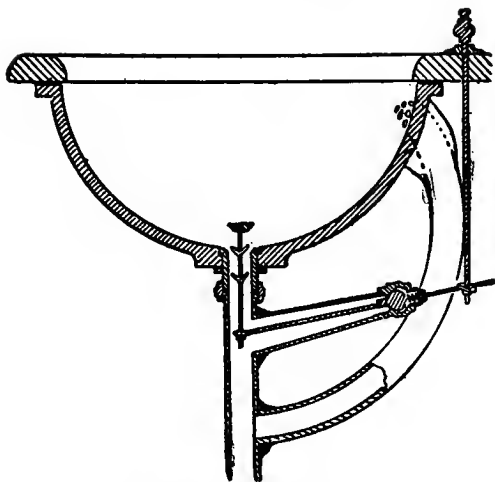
Valve-Outlet Basin with Improved Lever Movement.
